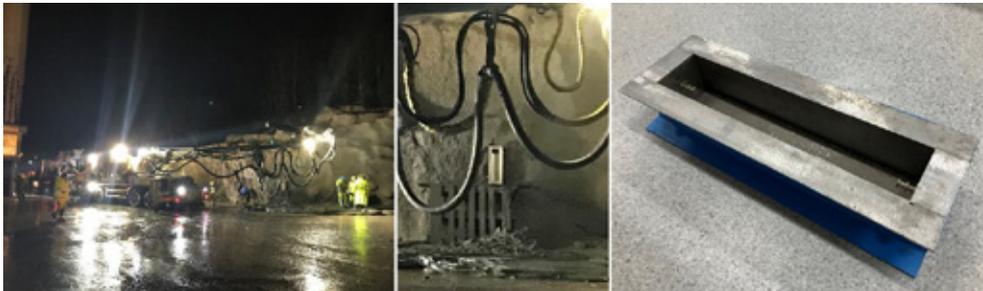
Left: Full-scale test of sprayed concrete Middle: spraying of specimens for shrinkage measurements. Right: Mould for shrinkage measurements.
